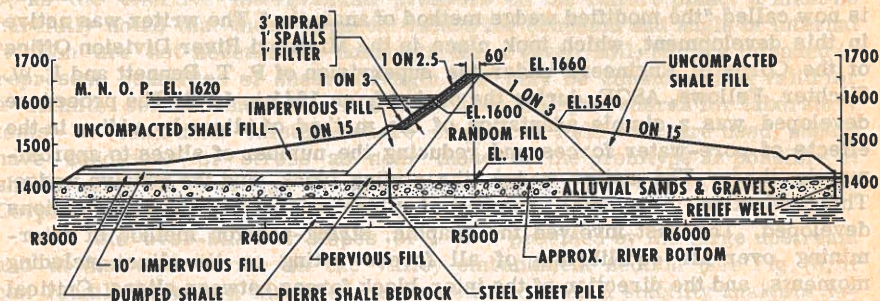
MAXIMUM EMBANKMENT SECTION
